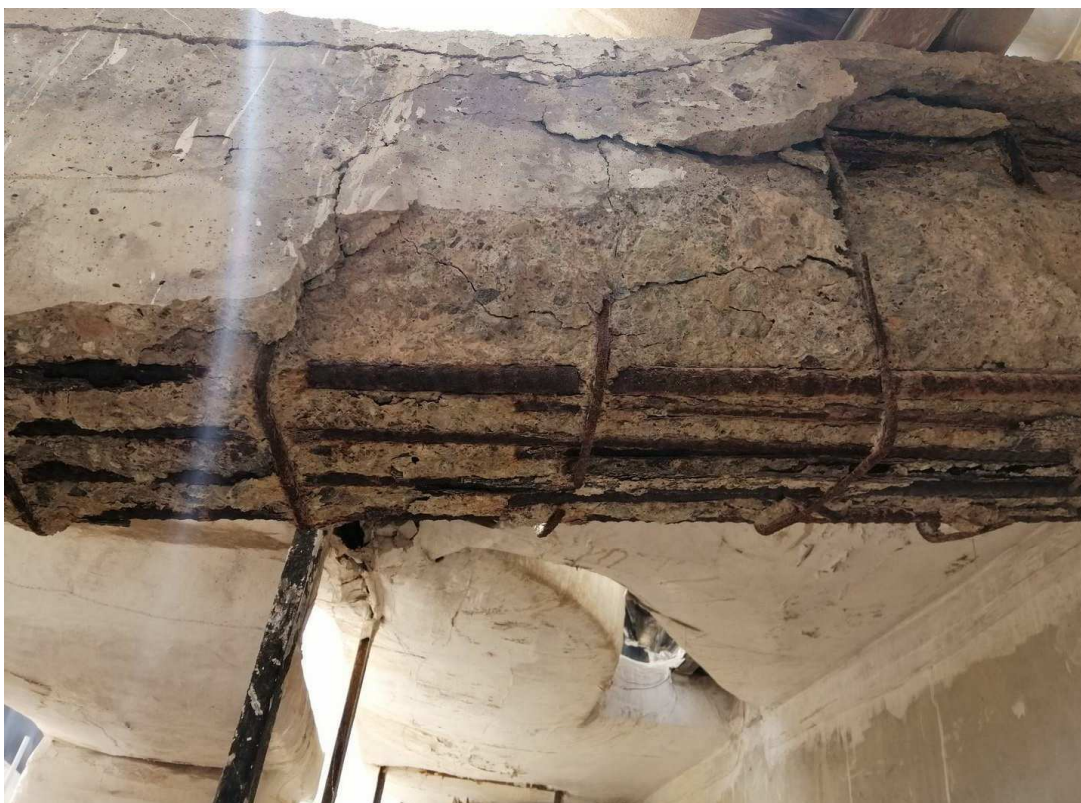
spalled cover and corroded steel at the playing area roof
